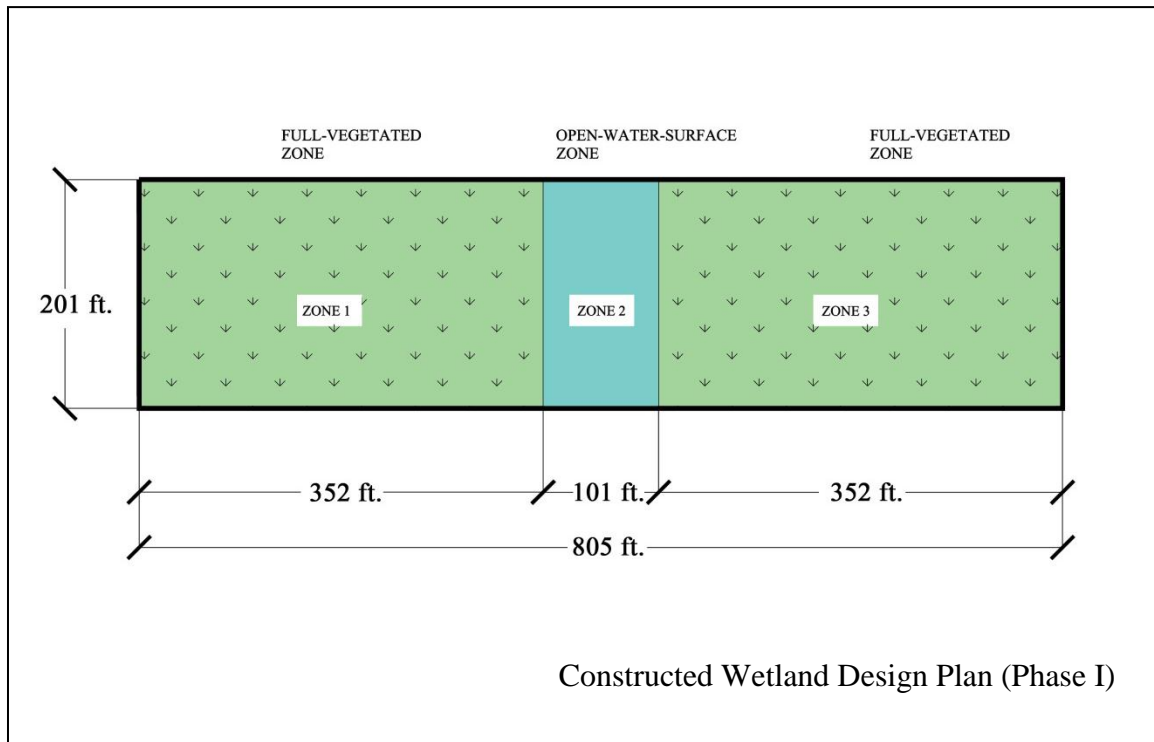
Design plan of the proposed constructed wetland plan based on current sewage volume.
